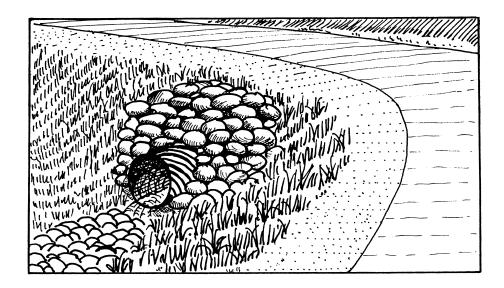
Rock headers on culvert outlet: headers (on 2:1 slope) at both ends prevent erosion.
